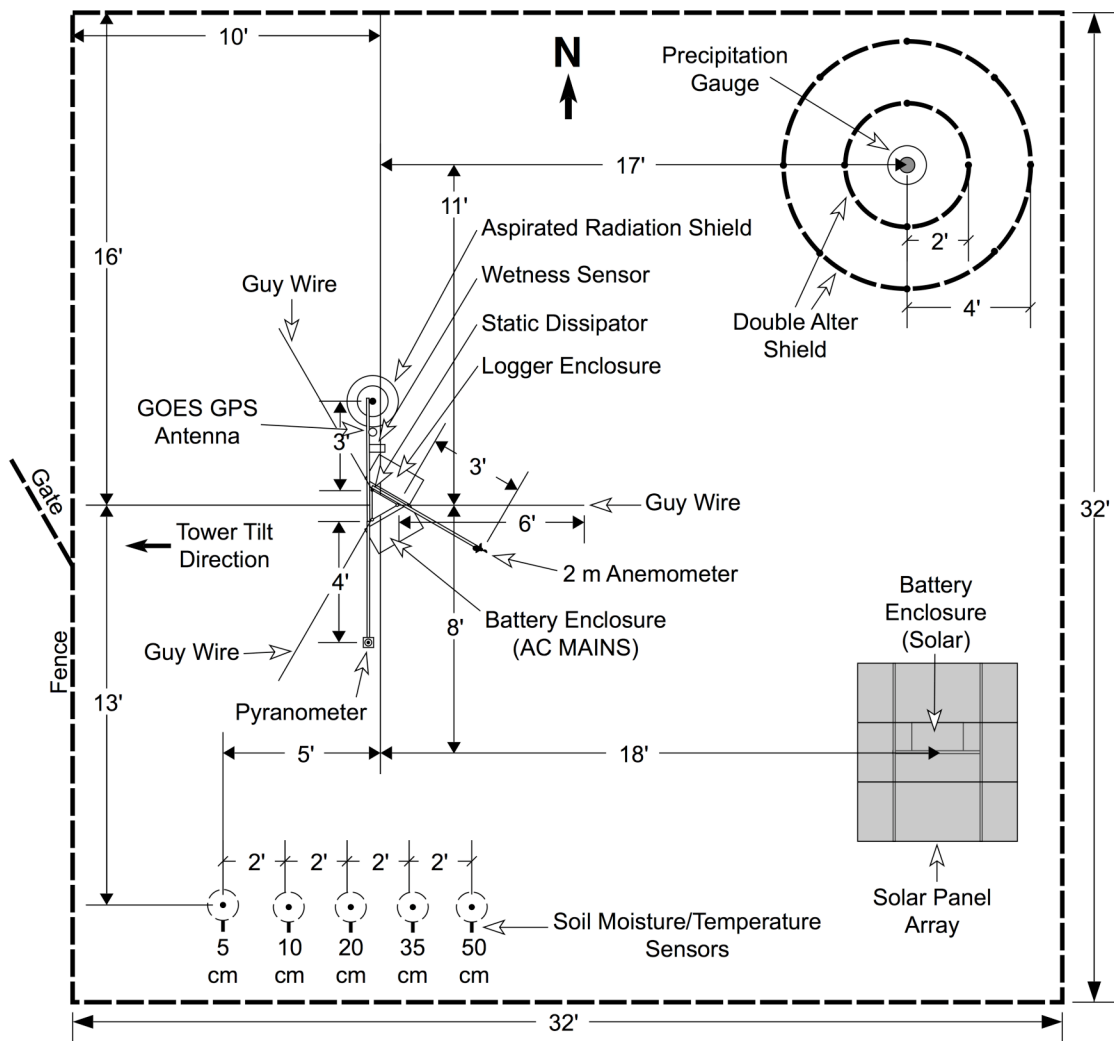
Plan view of a station plot that measures 32-by-32 feet and has a 3-meter tower.
